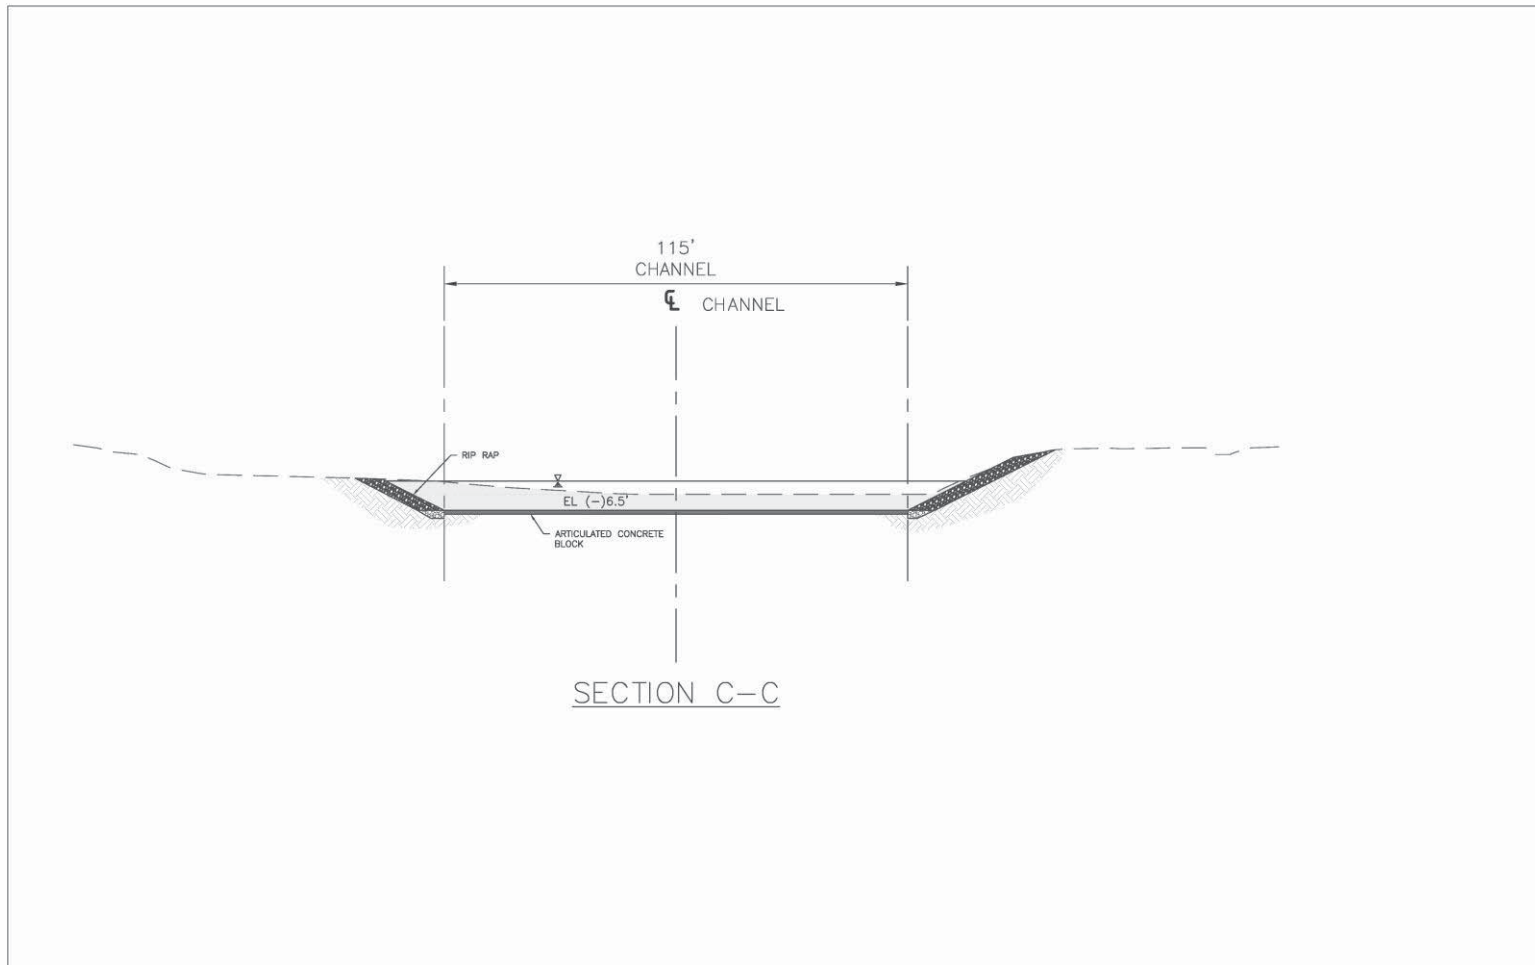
Cross Section C-C, Luis Muñoz Rivera Avenue Bridge
